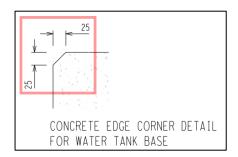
Excerpt showing the chamfered concrete slabs corner/edge typical detail of the water storage tank slab
